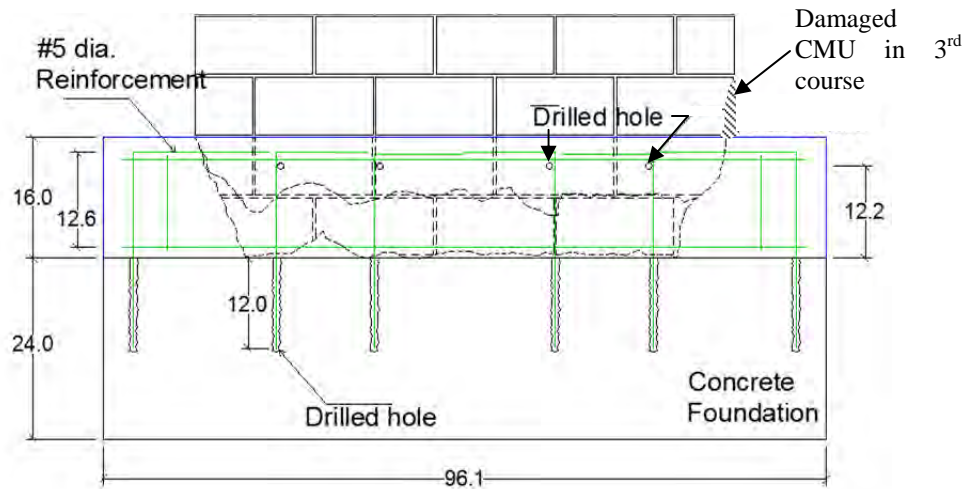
Internal reinforcement for the concrete ring. Side view.
